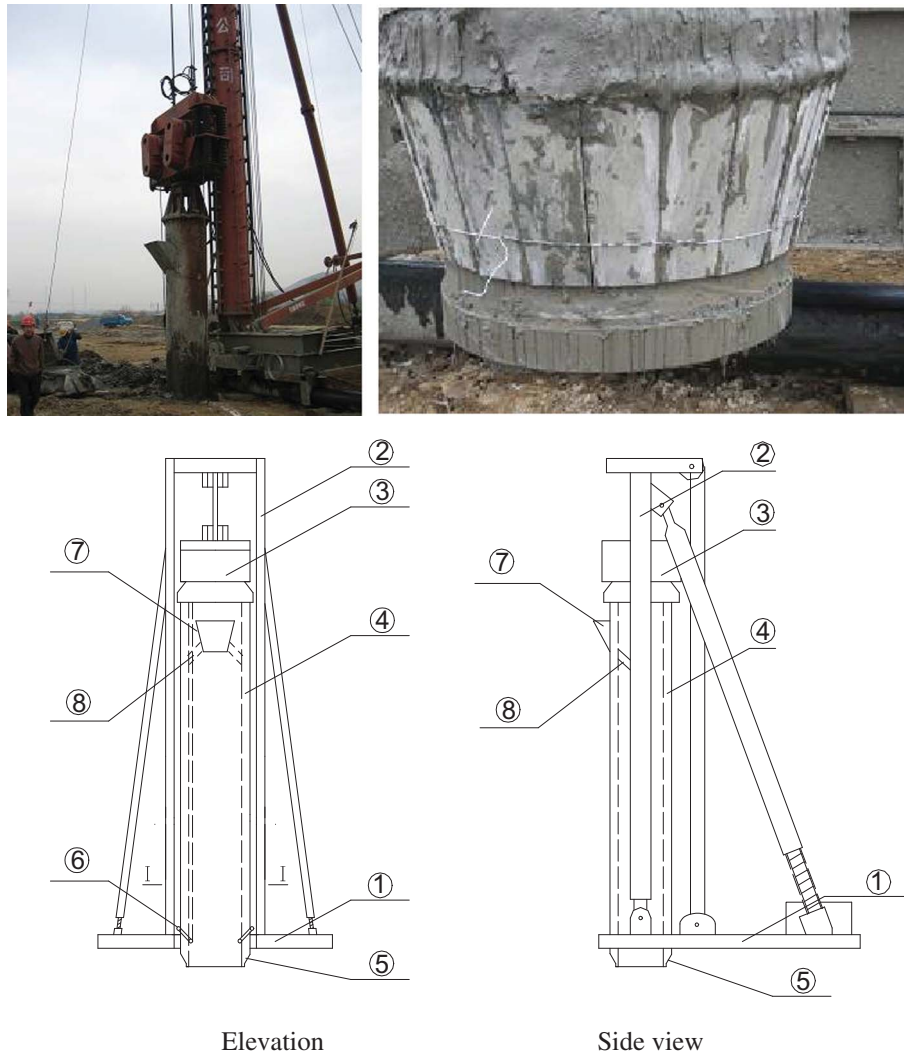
Schematic drawing of construction equipment. (1) Base of the equipment (including windlass); (2) Gantry crane; (3) vibration head; (4) double-walled steel casing; (5) valve pile boots; (6) into mud mode; (7) feed inlet; and (8) concrete shunt.
